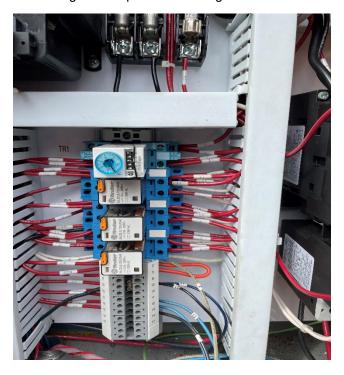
Inspection of the inside of the Blower A control panel electrical board.
